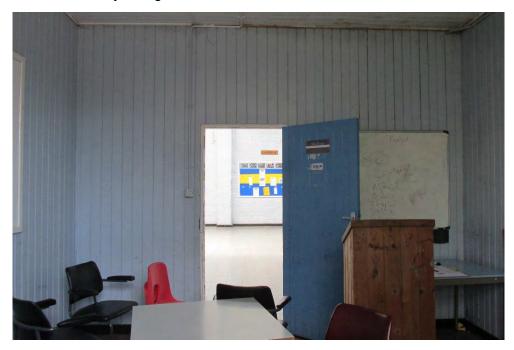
The blue painted panelled walls of the classroom, showing some mould to the top right corner, looking east
